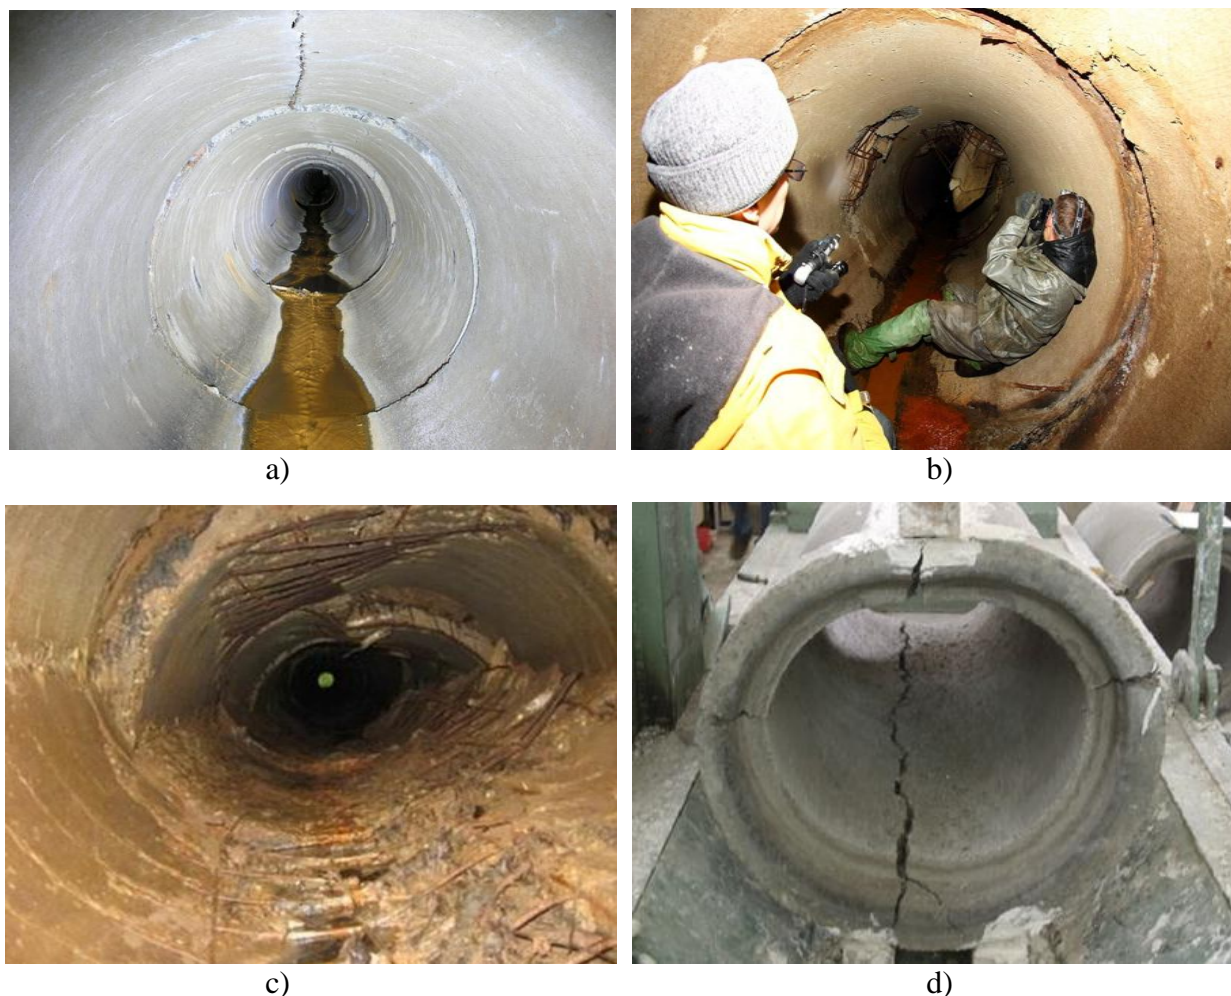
Defects in reinforced concrete pipes in operation:
